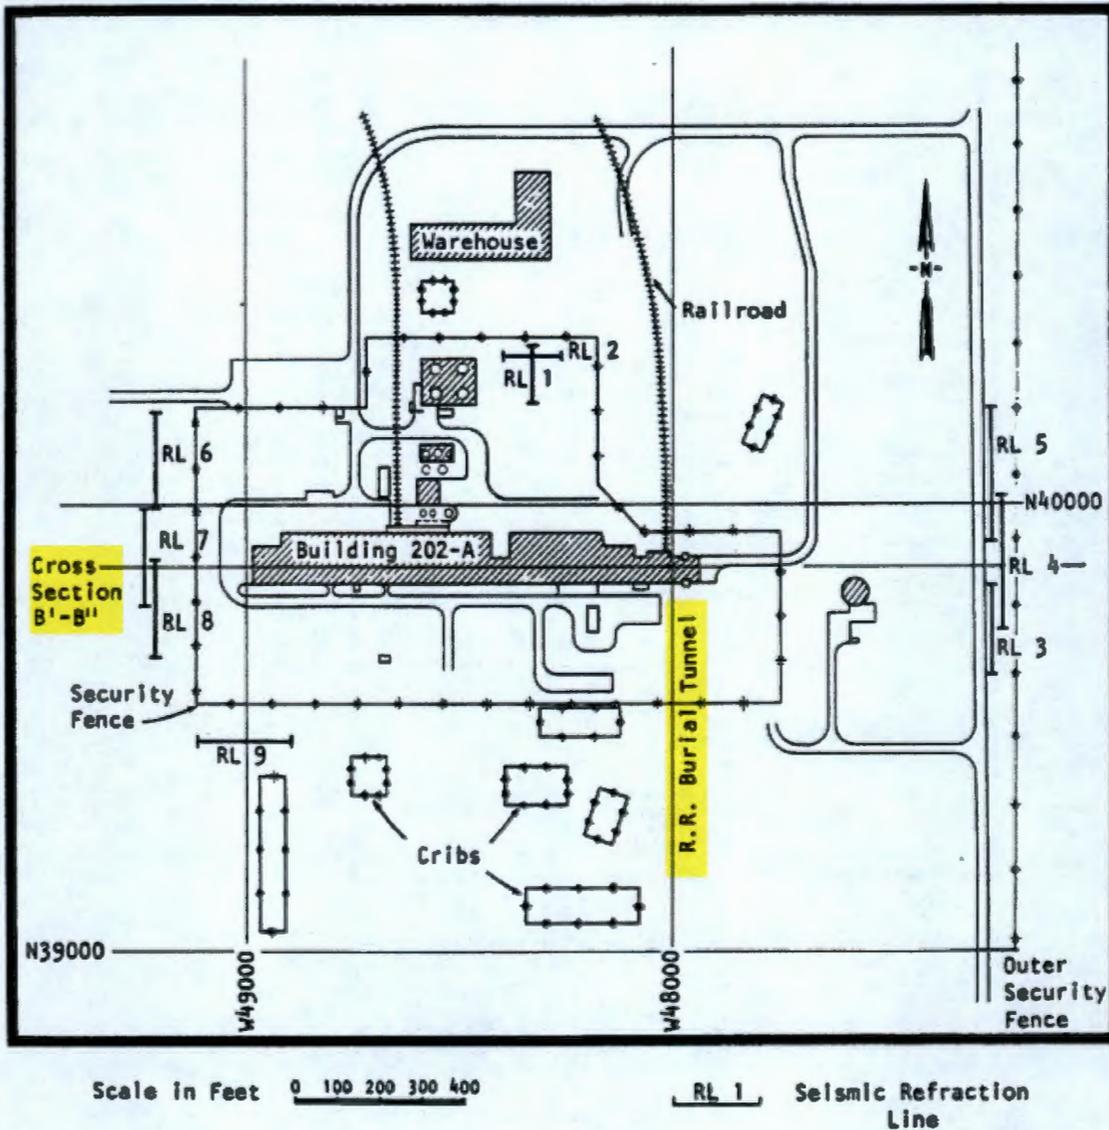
PUREX BUILDING SITE PLAN AND SEISMIC REFRACTION LINE LOCATIONS
